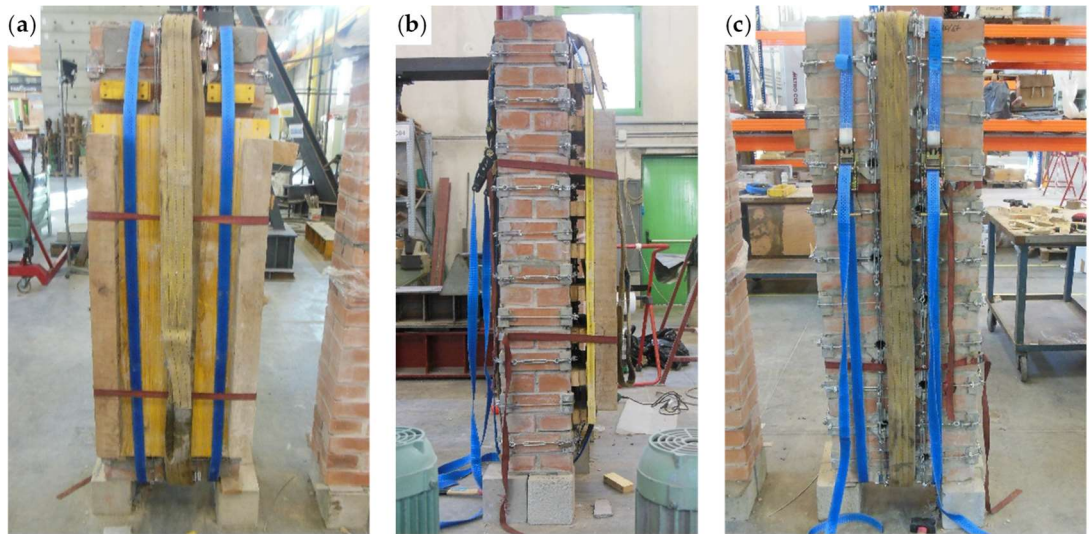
Slings of Specimen W5, used to allow handling and overturning of the specimen by means of the girder crane: (a) front view, (b) viewed from the left, and (c) back view.
